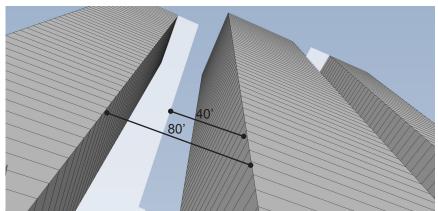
Skyview - Proposed Maximum Building Height 600'
